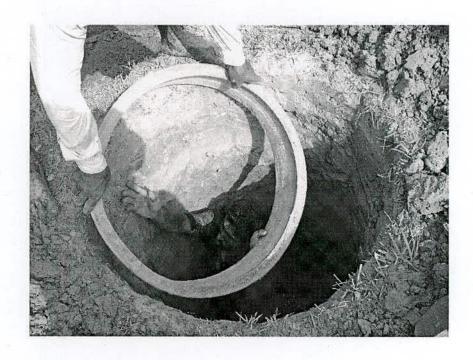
Placement of casing during the excavation hole for RAP construction.
